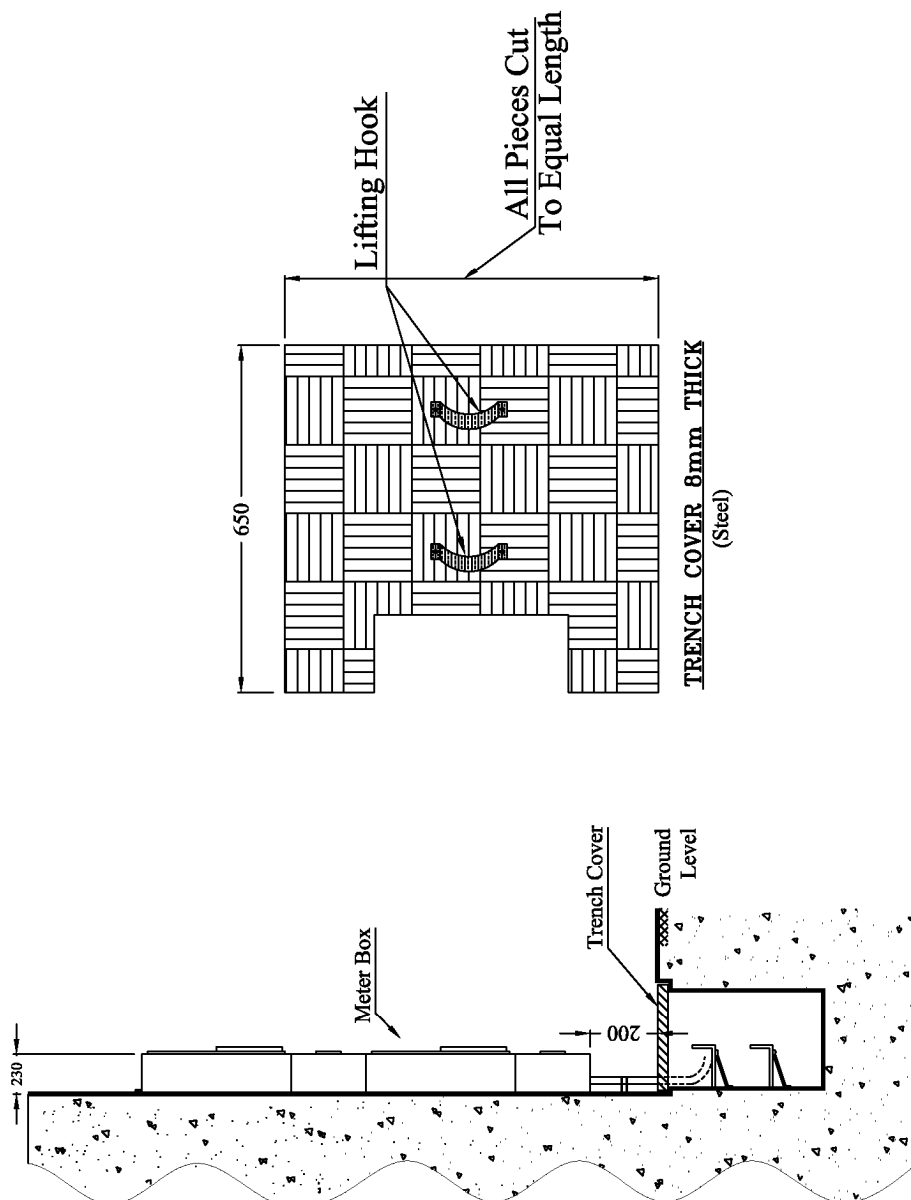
CABLE TRENCH INSIDE METERS ROOM
